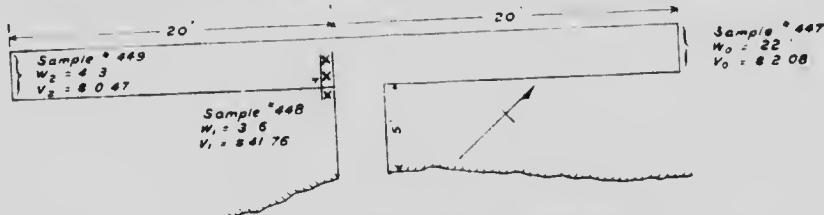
Sketch showing location of samples taken from Big open-cut, Humper No. 1.
